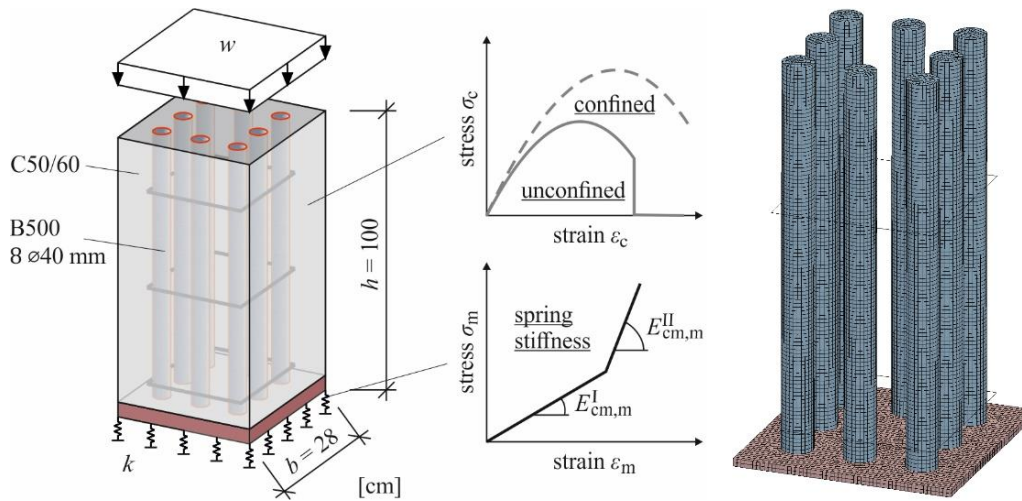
FE model of the butt joint in a reinforced concrete column: entire model with specific model properties (left); detail with hidden concrete elements (right)
